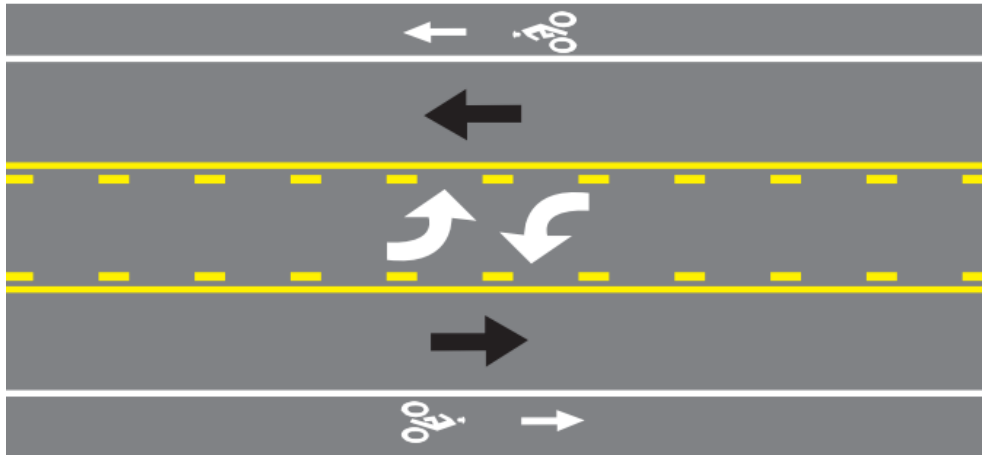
Three-Lane Road with Bike Lanes Typical Section
